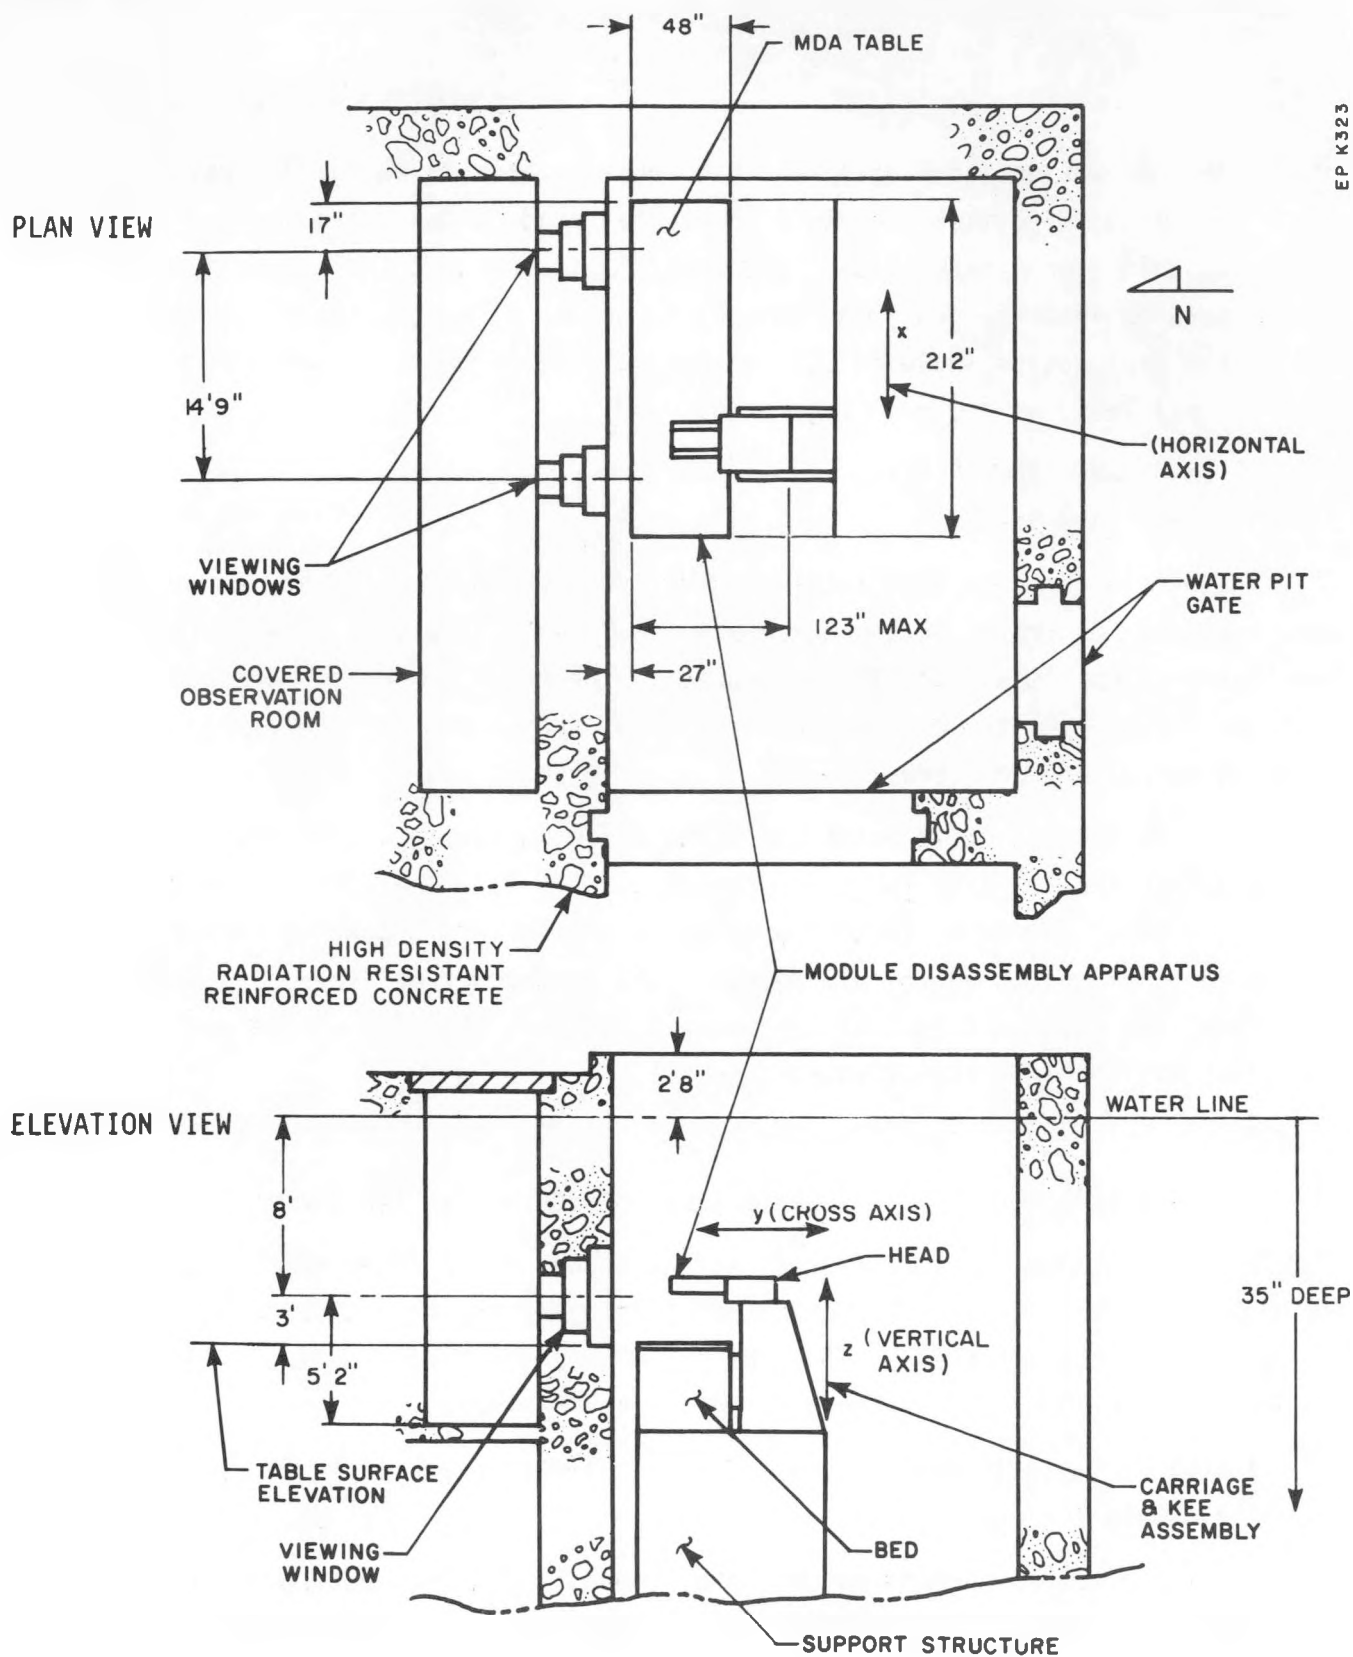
Module Disassembly Apparatus Location in ECF Water Pit
